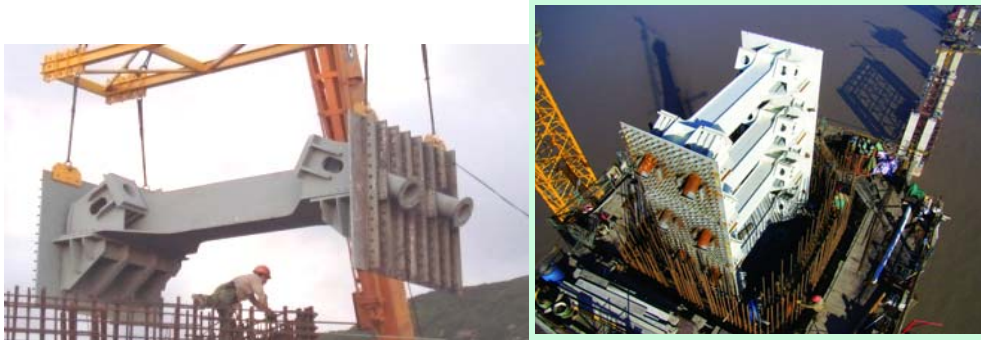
Composite Structure of Steel Bracket and Steel Anchorage Beam
